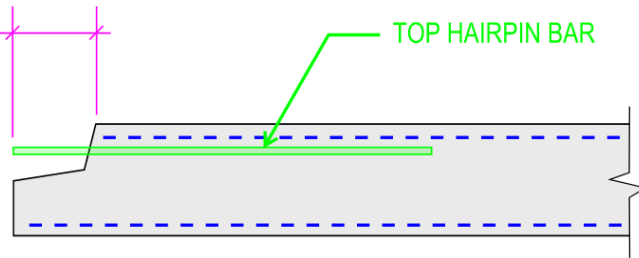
Typical cross-section at end of pre-cast slab panel. Indicating protruding top hairpin bar and rebate at end of panel.
